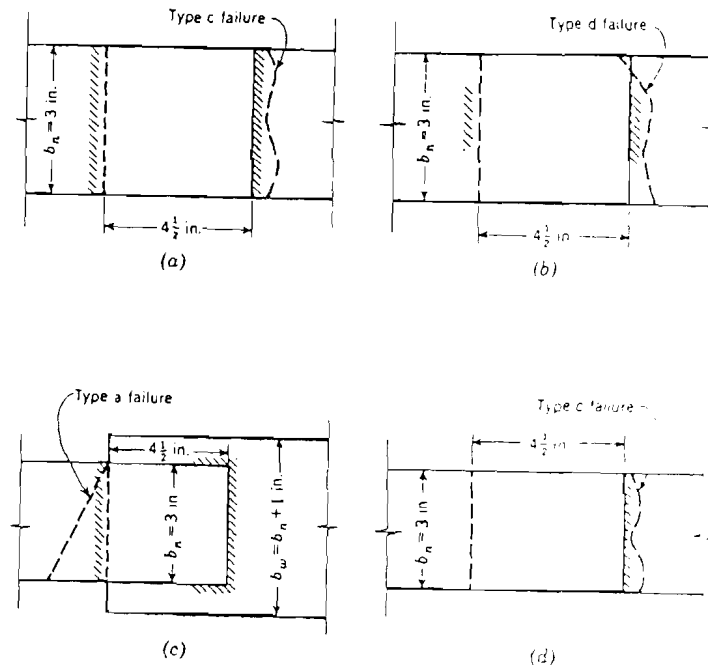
Transverse Fillet Weld Specimens (a) Single Lap, Full Length Weld; (b) Single Lap, Partial Width Weld; (c) Single Lap, Unsymmetric Weld; and (d) Double Lap, Full Width Weld [Dhalla and Winter (1971b)]
